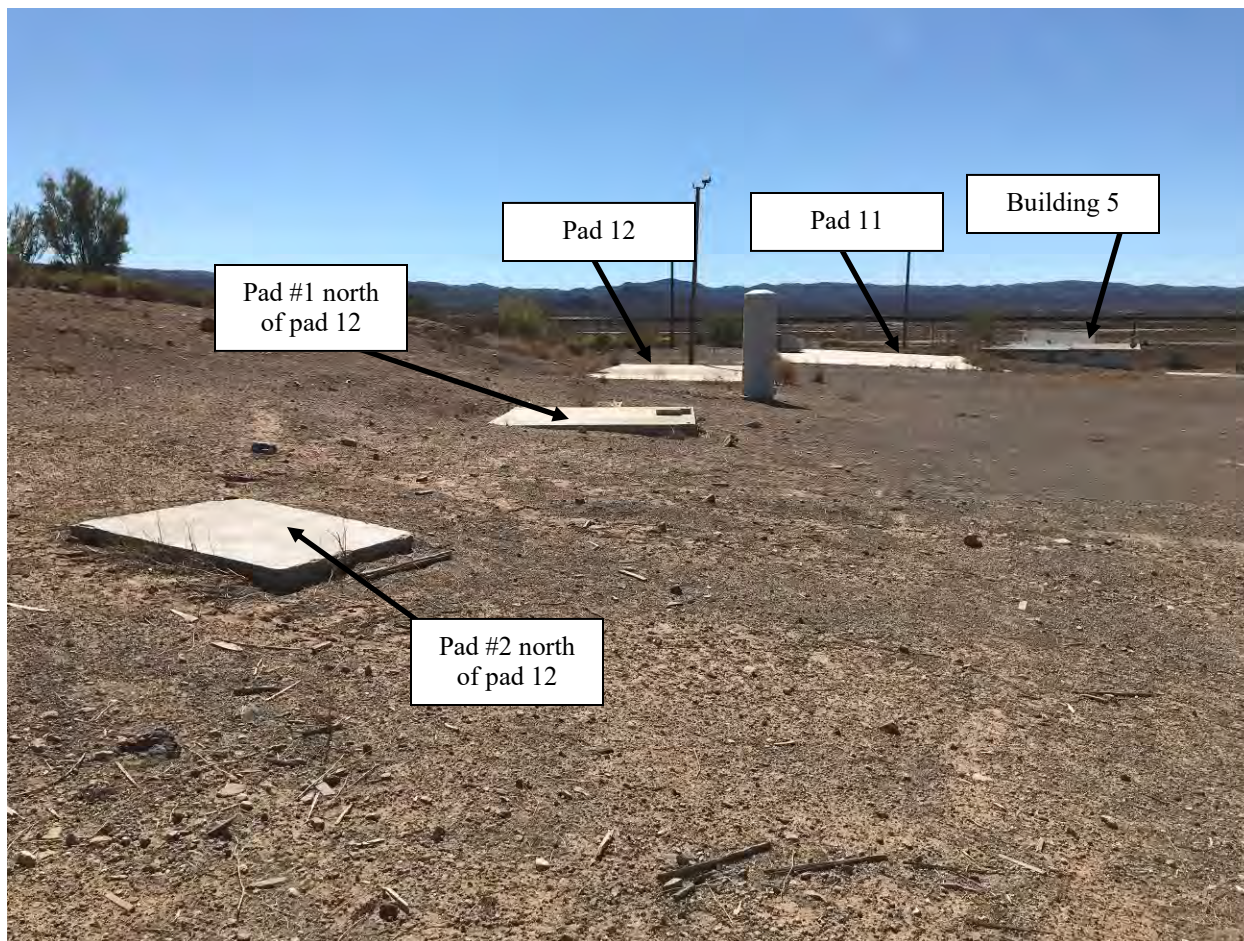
Ground level photo of pads from demolished structures north of building 5.
